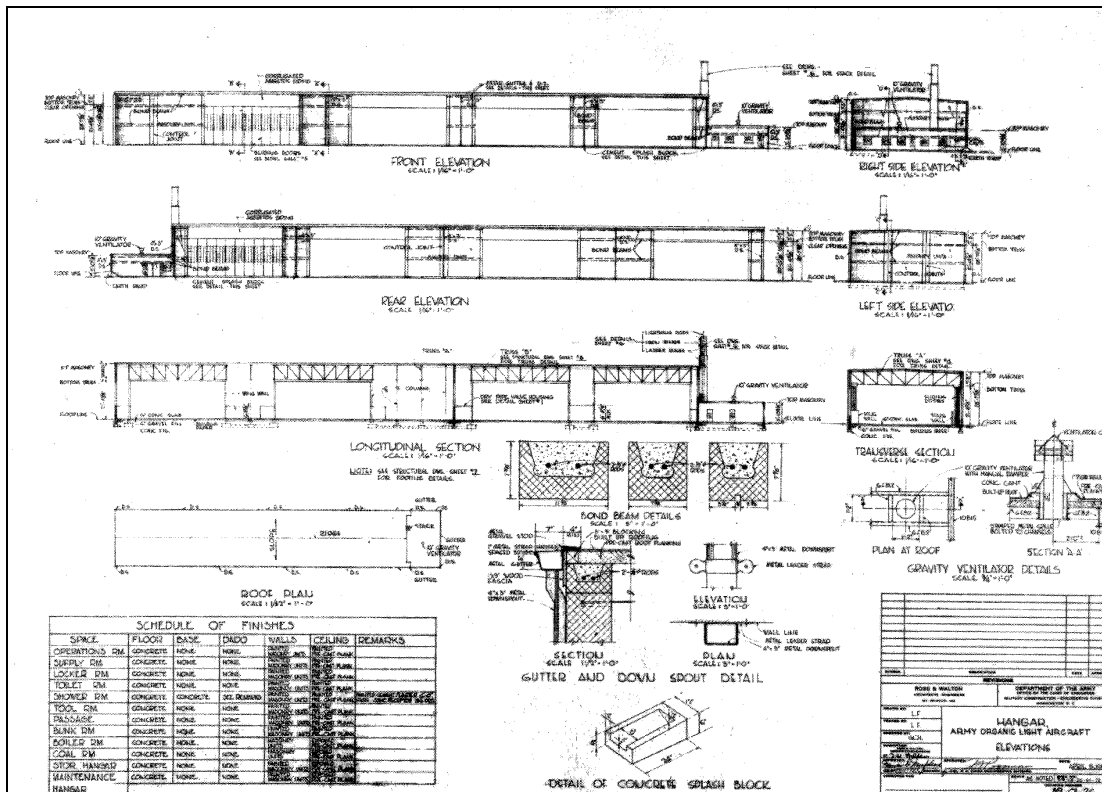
Plan No. 39-01-26, Hangar - Army Organic Light Aircraft.
